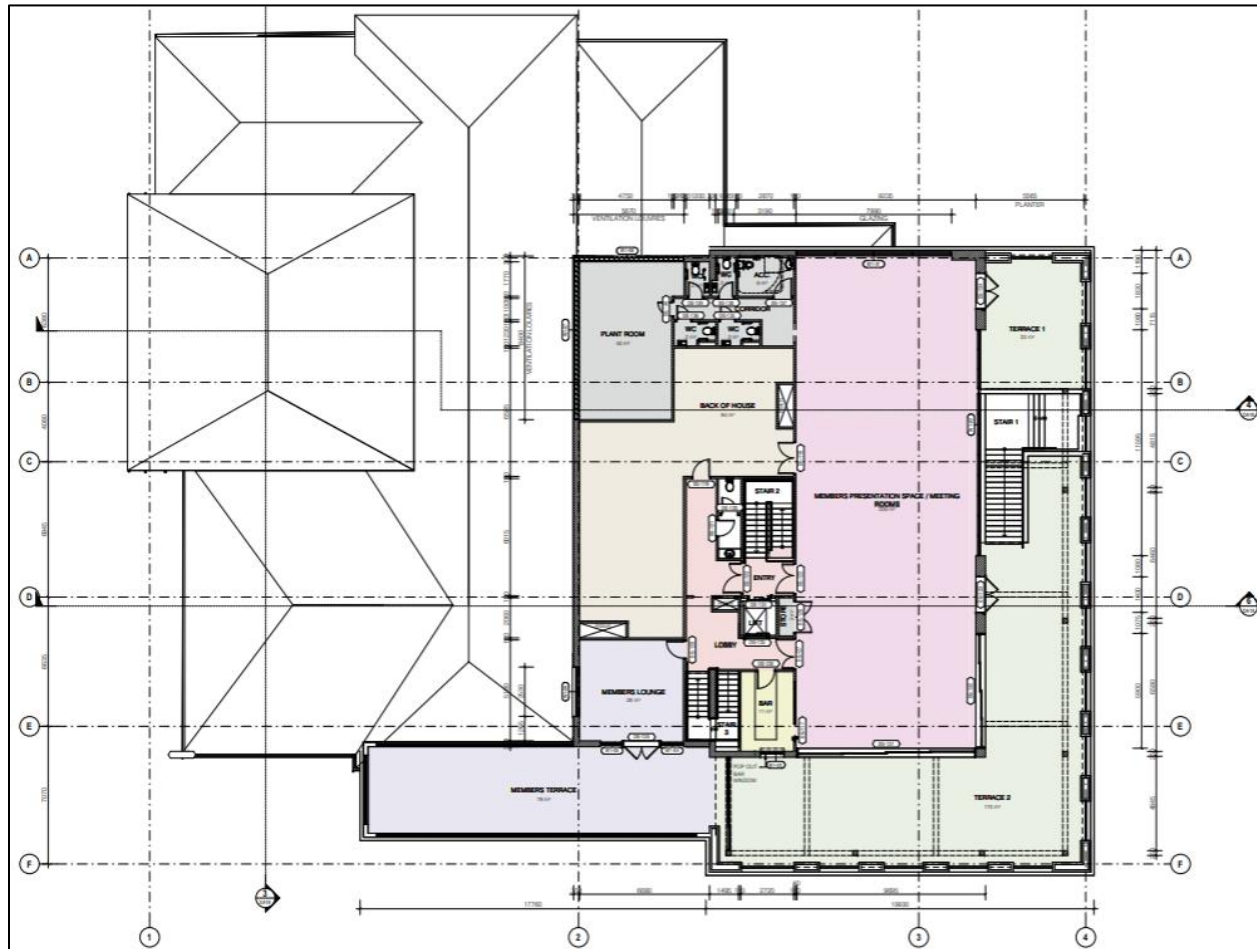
Proposed First Floor Plan (Source: i2C; January 2025)
